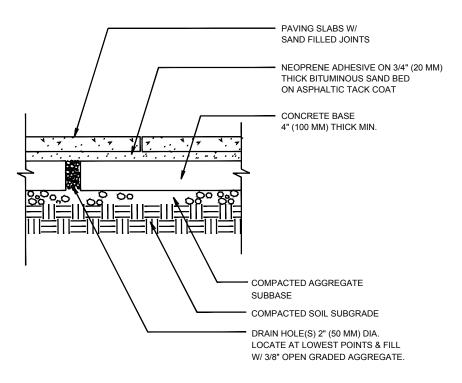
Typical cross section of bitumen-set paving slabs on a concrete base
